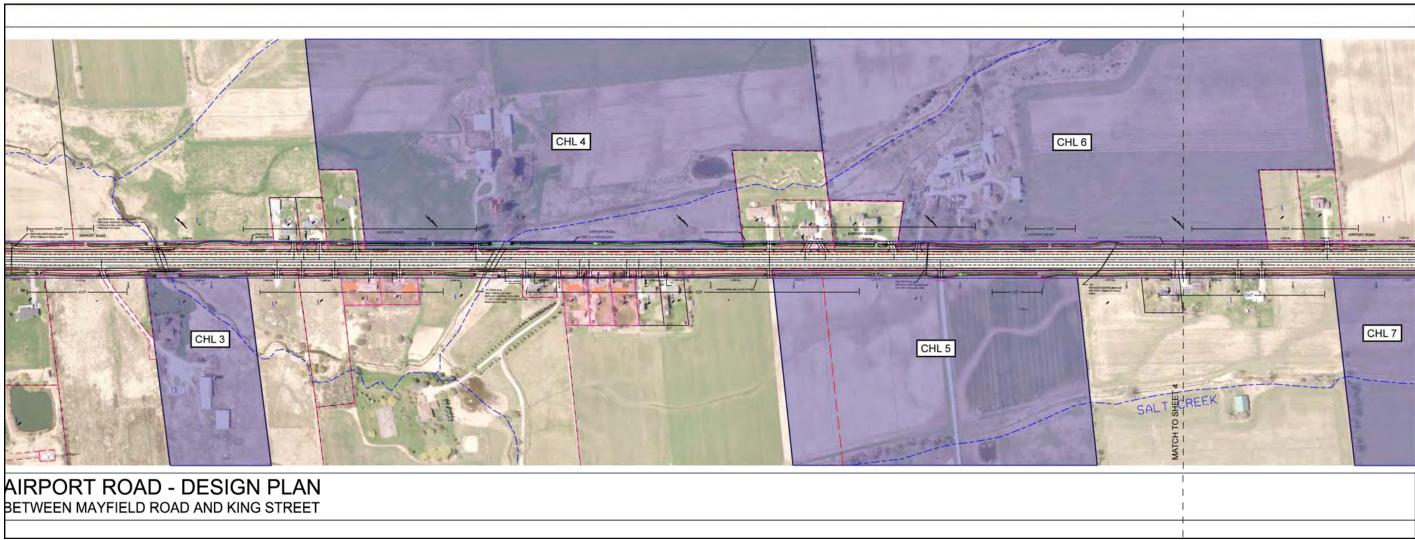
Proposed work for the Airport Road EA (Sheet 3)
